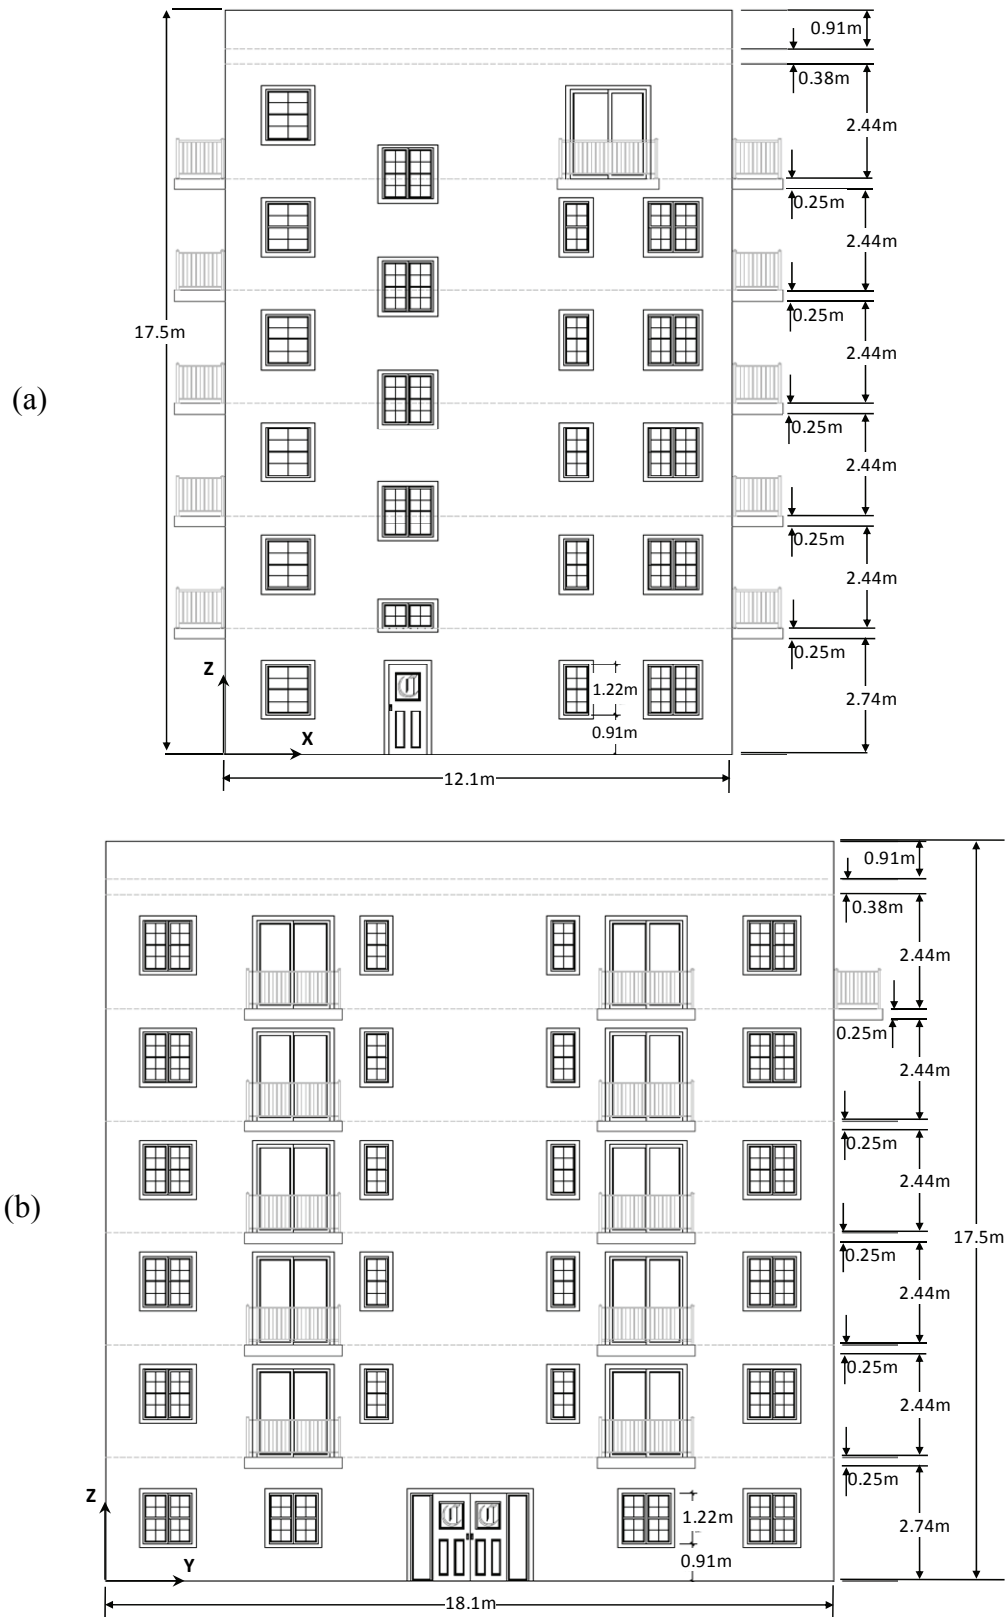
Elevation views of the six-story NEESWood Capstone Building, (a) south elevation and (b) west elevation.
